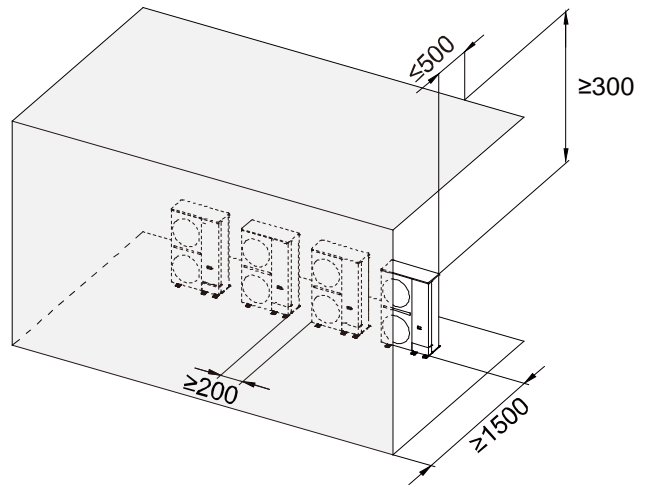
More than one outdoor unit installation (unit: mm)
